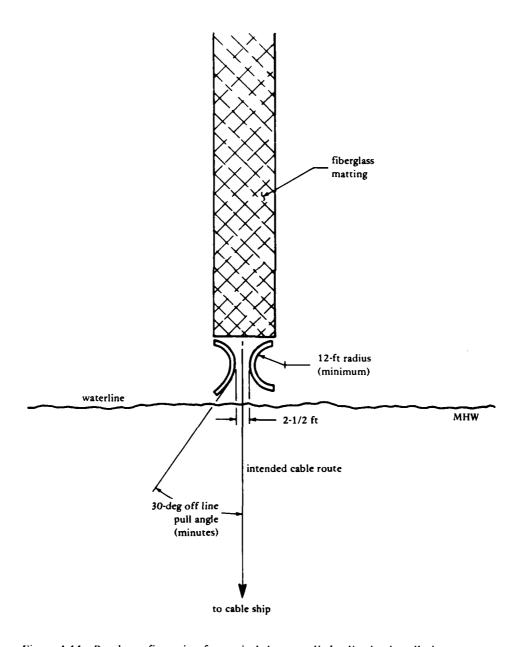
Beach configuration for typical shore applied split-pipe installations.
